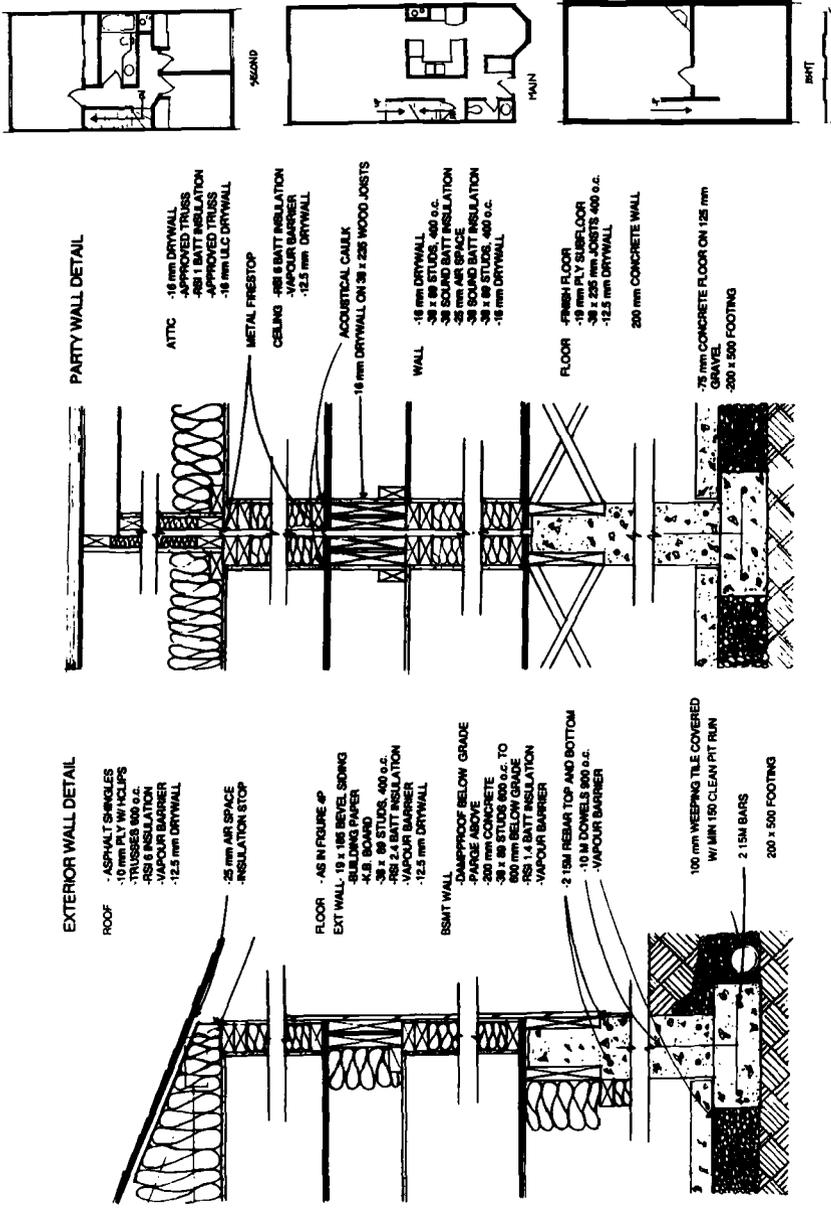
Exterior wall section, party wall section, and floor plans for Project 4.
